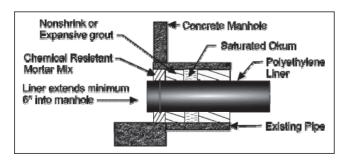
Typical Manhole Seal for Gravity Flow Applications
